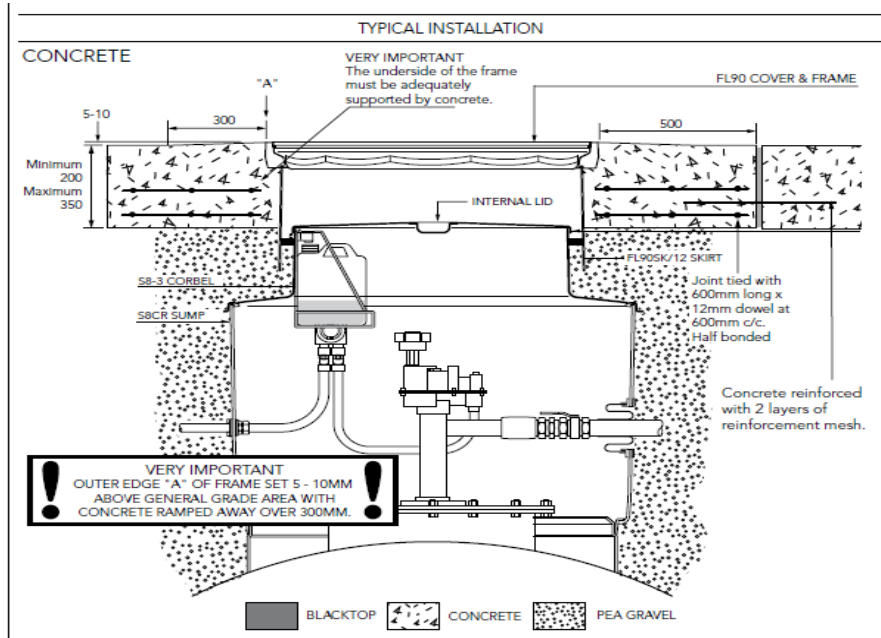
Typical Installation of a Water Tight Containment System for UGT
